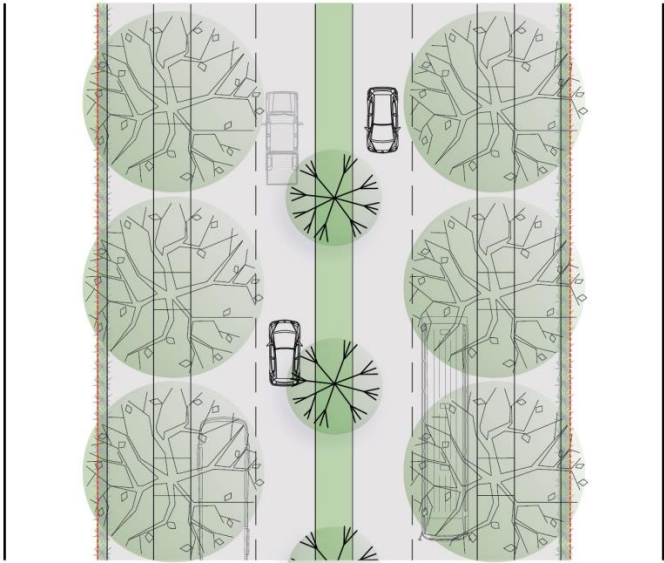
Carrington Road (from Showground Road to Middleton Avenue)
